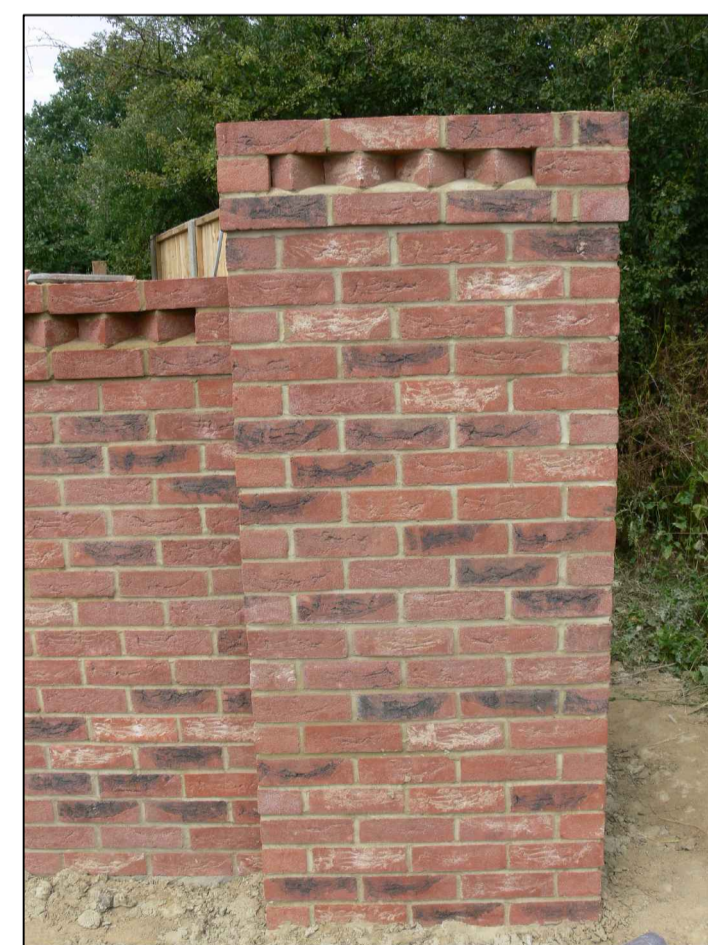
PIER TYPE A (UNDER CONSTRUCTION)
